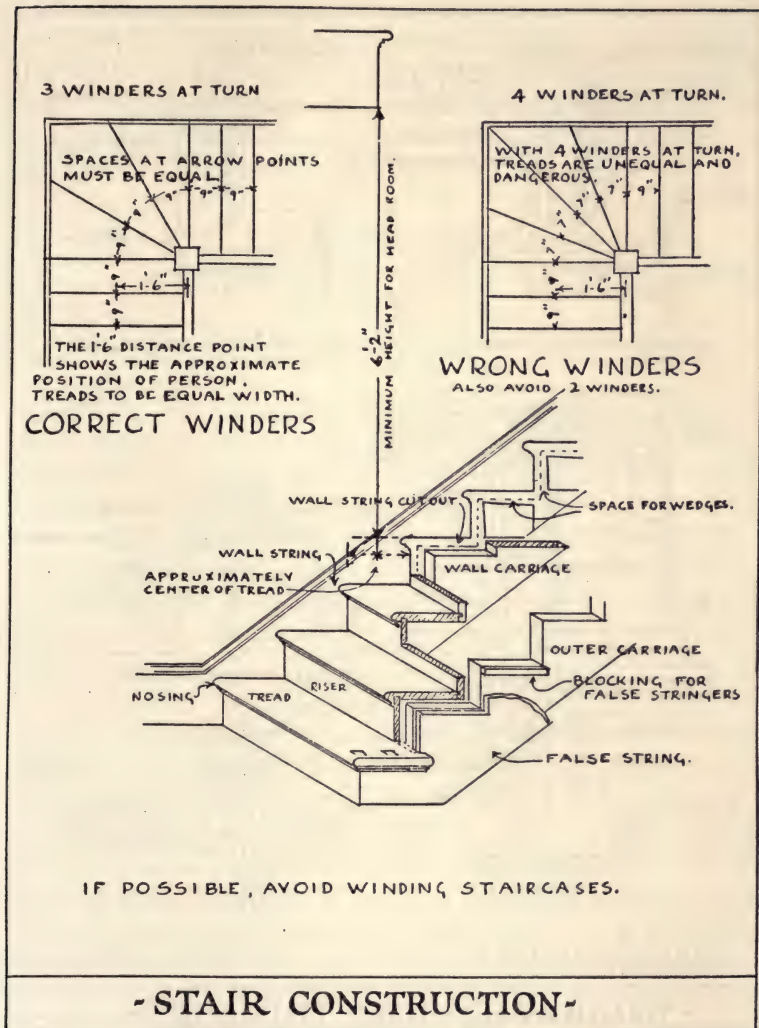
Well-constructed stairs are built up and fitted together. The treads must be of hardwood. Many building codes prohibit the use of winders.
